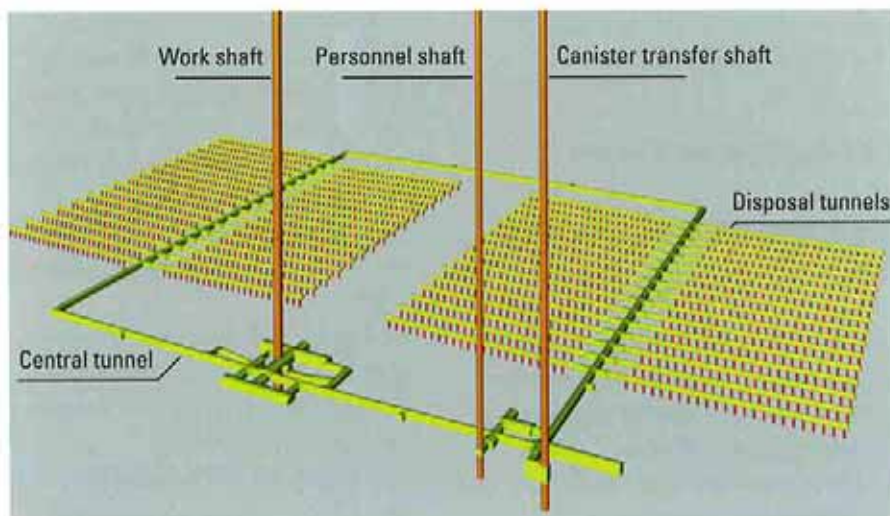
An example showing the layout of the shafts, central tunnel and repository tunnels.
